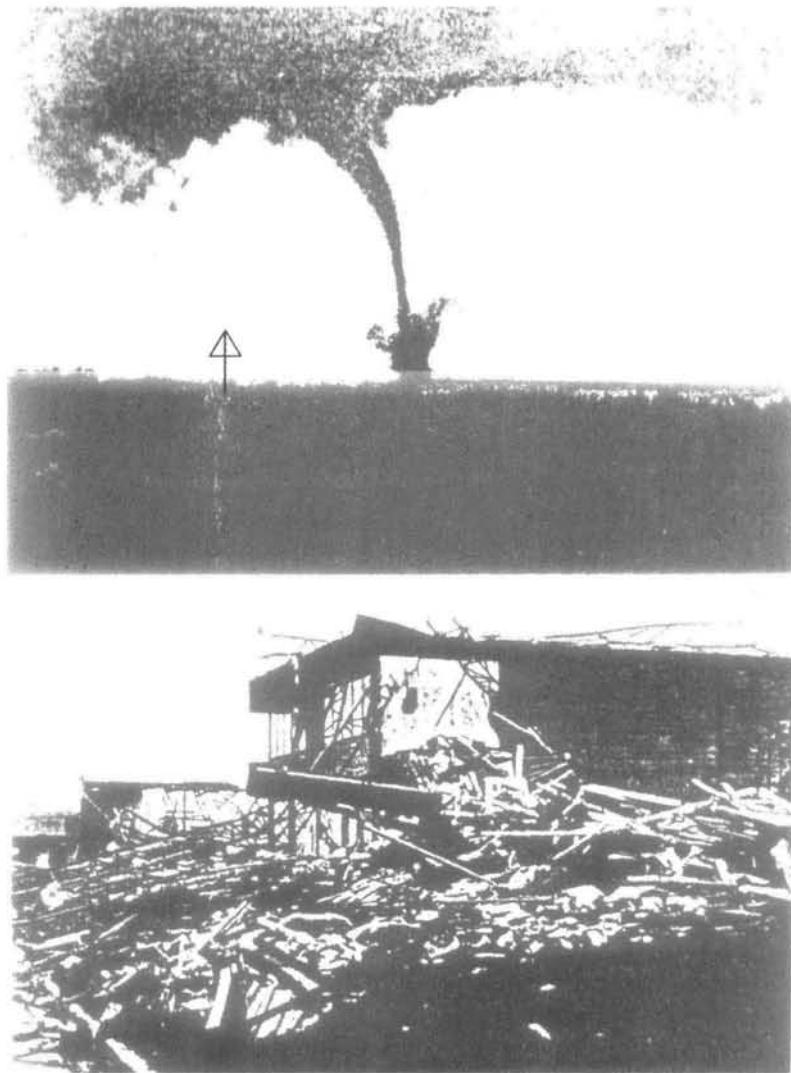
The tornado (upper photo) which struck Edmonton, Canada on 31 July 1987 left 26 dead and cause damage amounting to US\$350 million (lower photo)
